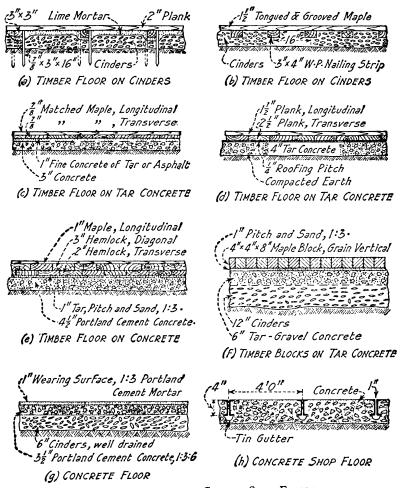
EXAMPLES OF GROUND SHOP FLOORS.
